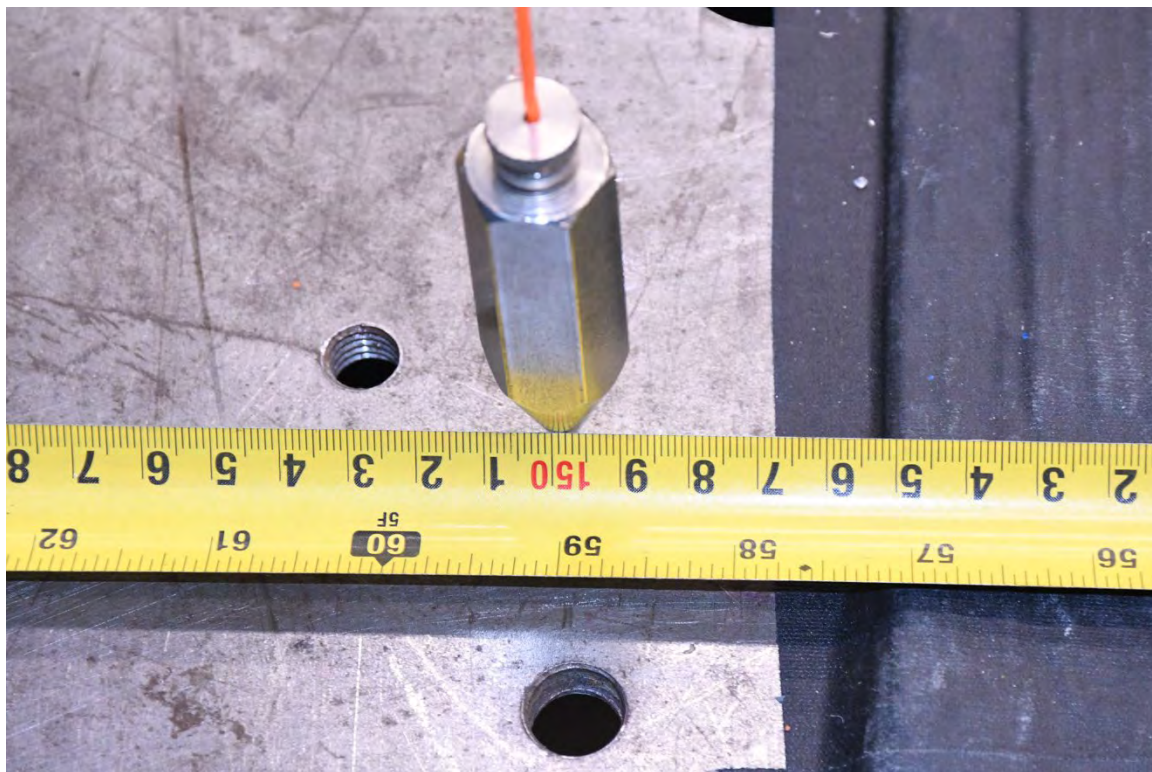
VP2409 Pre-test View of Plumb bob Measurement
